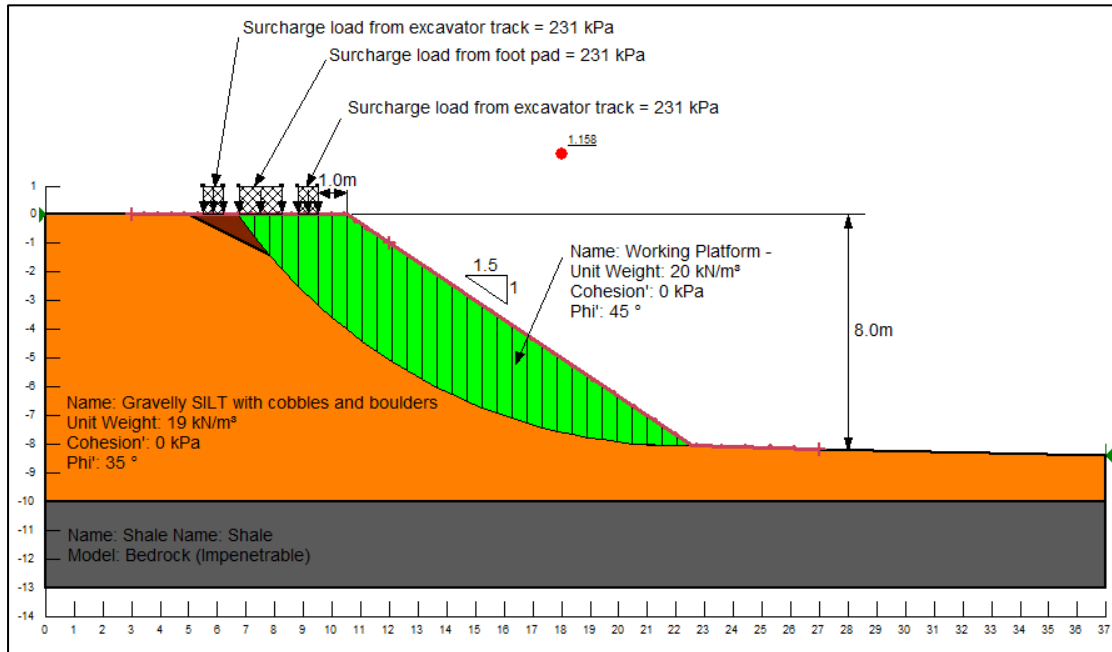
Castlewellan Road On-Slip – Temporary Working Platform Slope Stability
